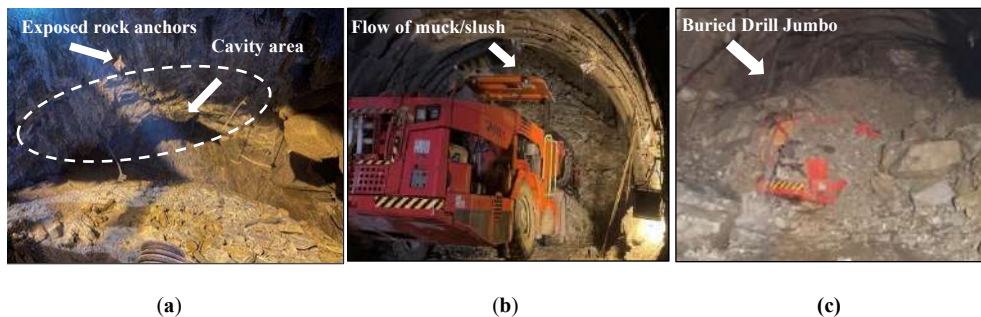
(a) Formation of cavity due to rock bursts; (b) The flow of muck, slush, and groundwater ingress from the cavity; (c) Filling of the tunnel by muck and slush and burial of the drill jumbo.
